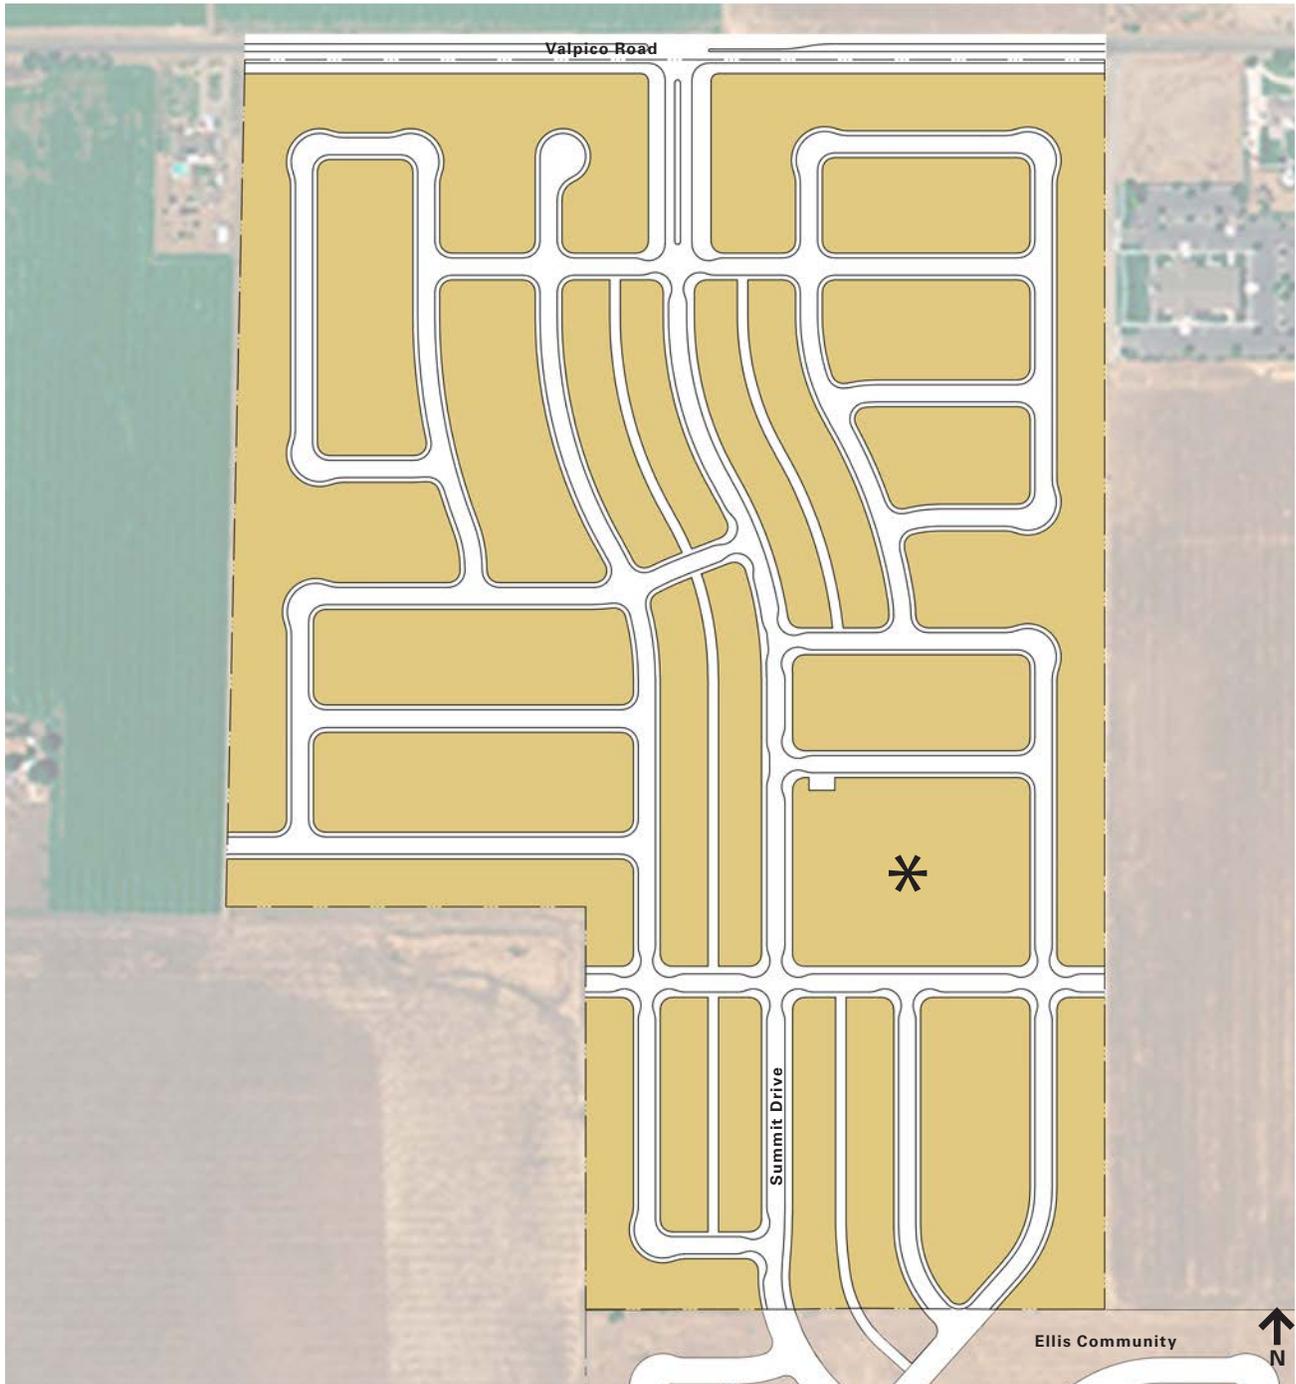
Avenues Neighborhood Plan Subdivision Layout/Zoning
